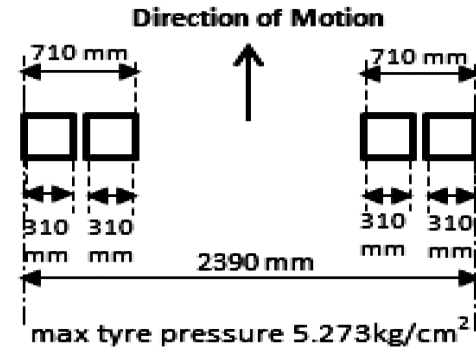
B: Transverse Wheel Spacing and Tyre Arrangement
